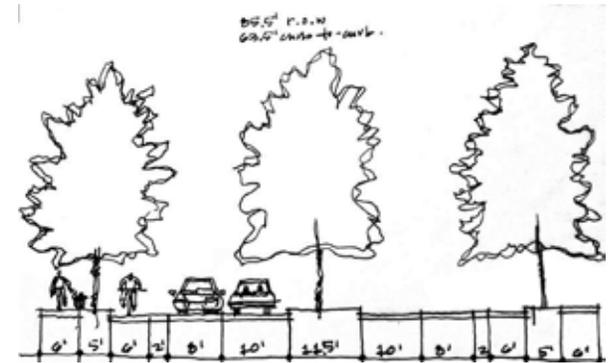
Potential Normal Avenue cross-section with protected bikeway.
